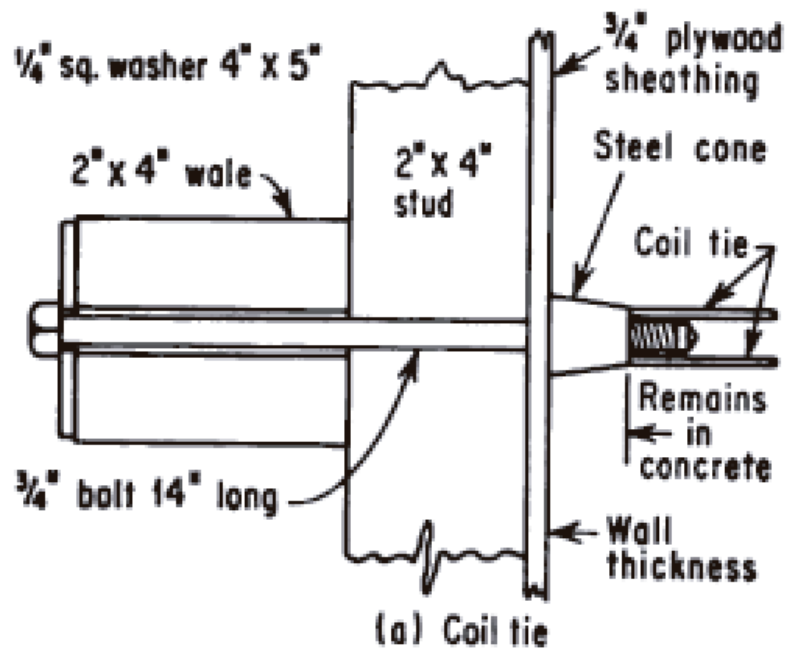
Coil tie for plywood formwork. Source: William S. La Londe. Ed. *Concrete Engineering Handbook* (New York: McGraw-Hill, 1961), 2-5
